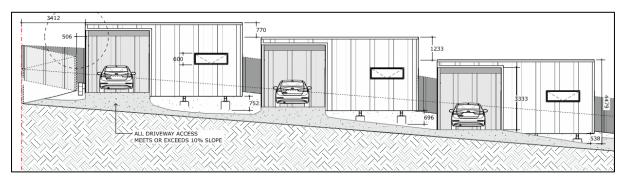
Proposal Plan - Elevations. Source: Offest Australia
